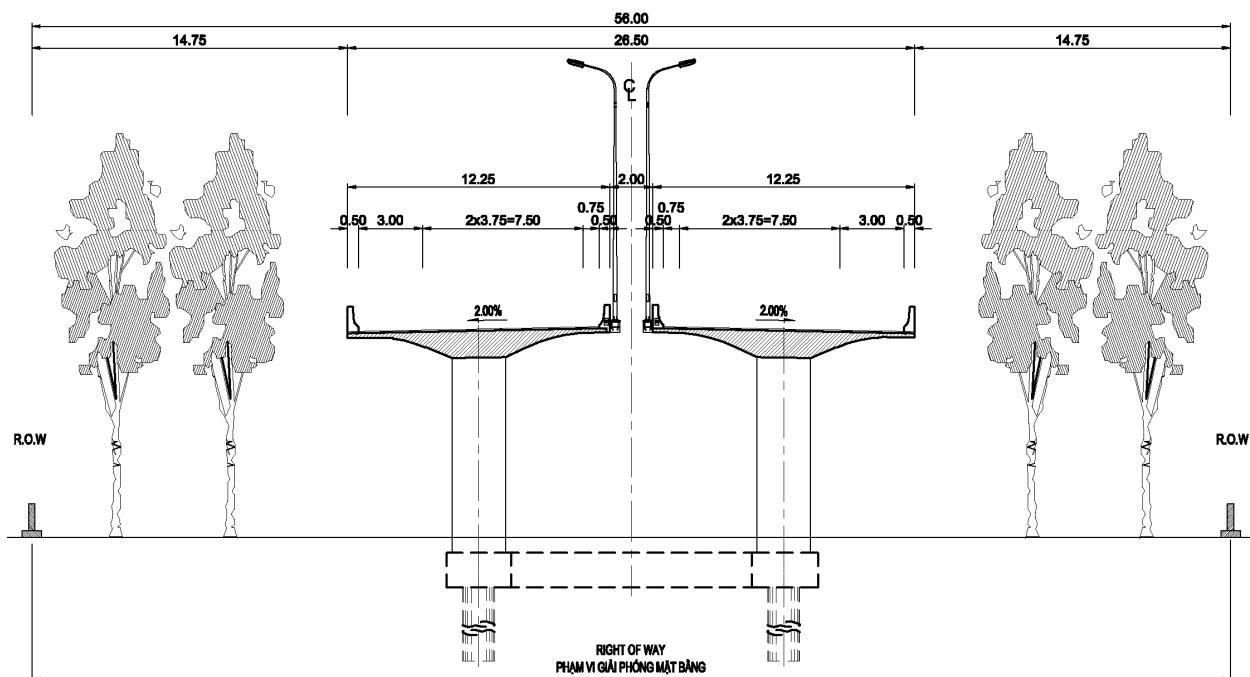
Typical 56-m width ROW in the Viaduct & Bridge Sections Phase 1
